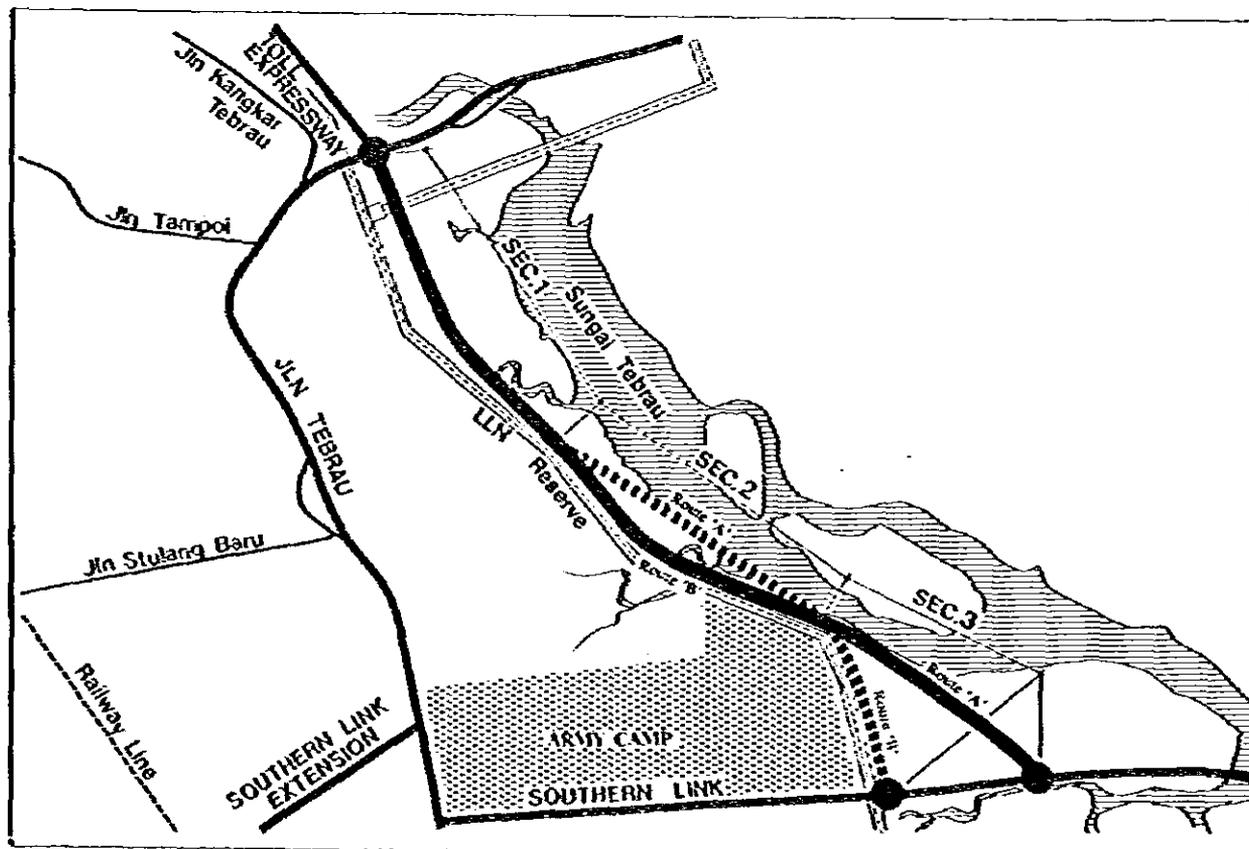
ALTERNATIVE ROUTES OF TOLL EXPRESSWAY ACCESS ROAD
